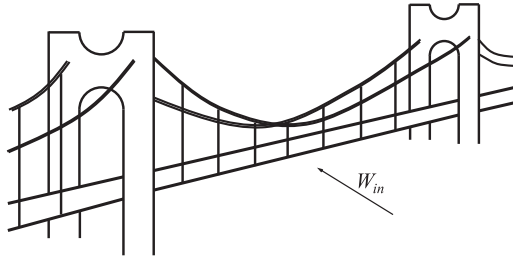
Vertical vibration of a suspension bridge subject to wind loading.
